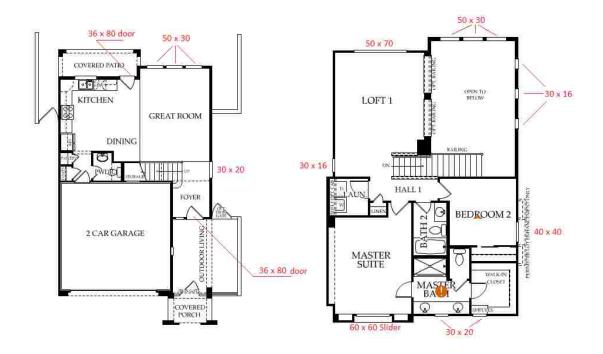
VILLA TRIESTE FLOOR PLAN UNDER INVESTIGATION
